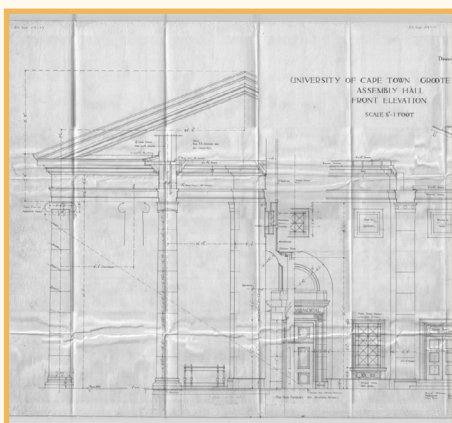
Original architectural drawing of Memorial Hall. Photograph provided by David Gibbs.
